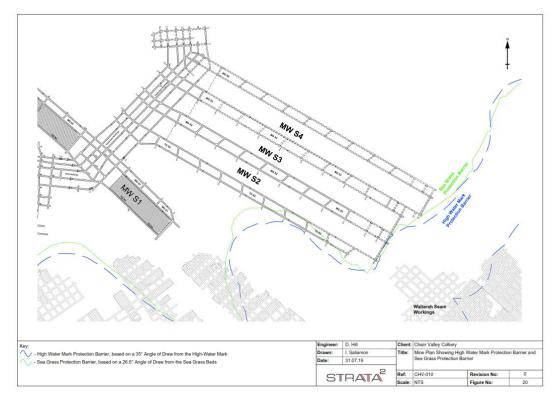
S2, S3 and S4 Miniwall (MWS2, MWS3 and MWS4) Protection Barriers and Wallarah seam workings location (Strata2, 2019)
